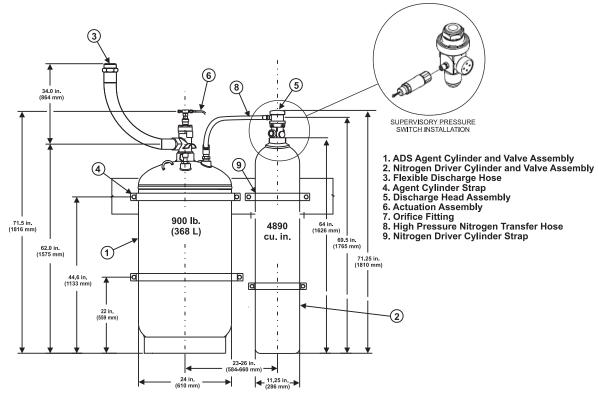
Single Cylinder Installation Dimensions, 900 lb. (368 L) Cylinder
